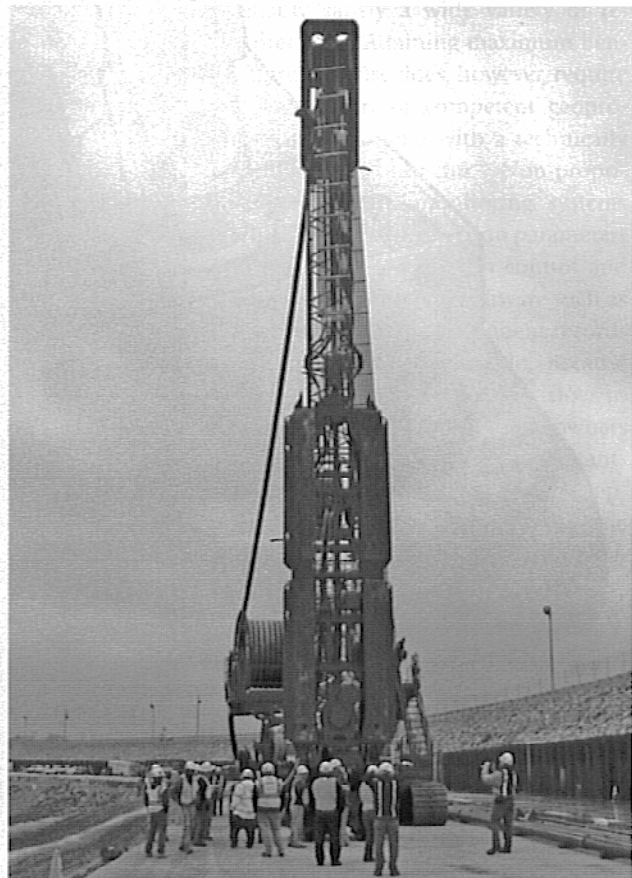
Hydromill equipment for concrete cutoff wall excavation.
